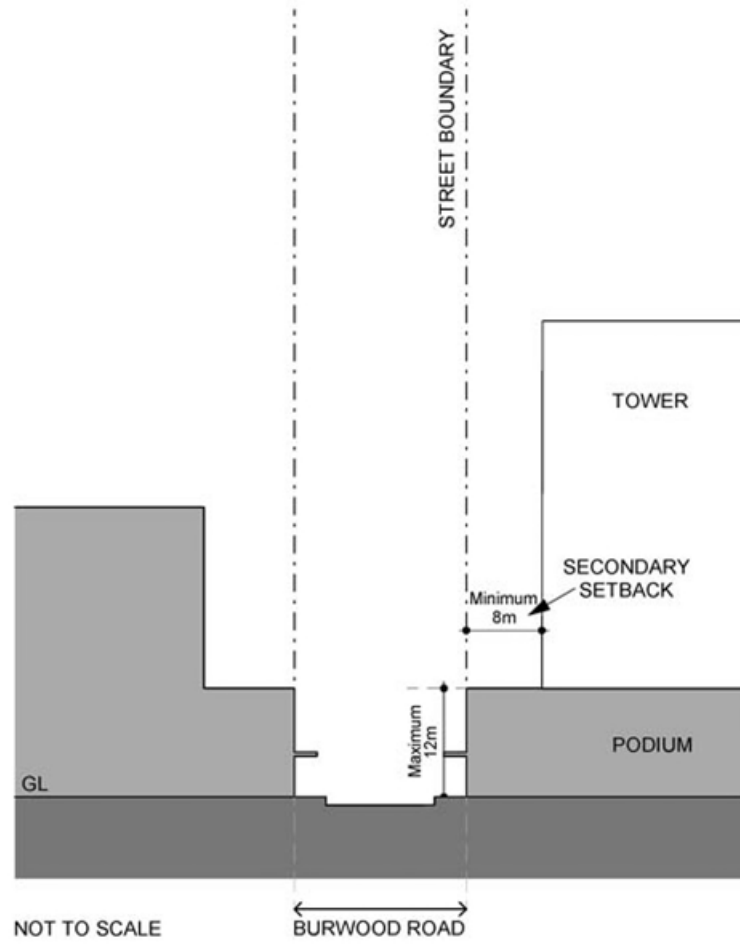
Burwood Road: Burwood Road Secondary Setbacks – Section Diagram
